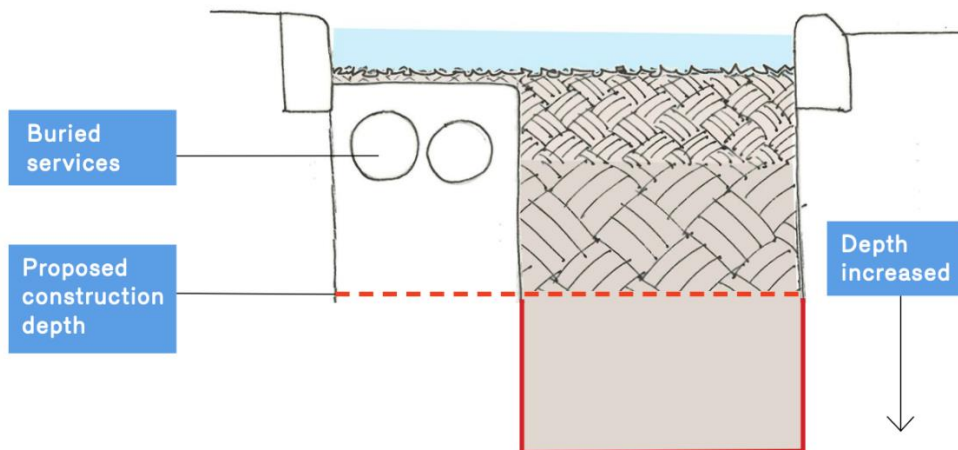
Cross section illustrating how the construction depth of a rain garden can be increased locally to account for existing services (Urban Design London, undated)
